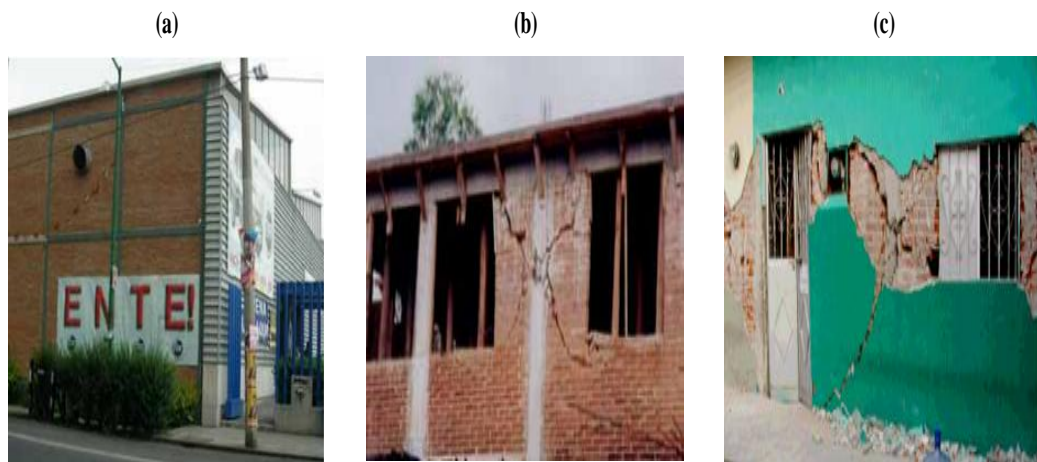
Confined masonry construction in Mexico (a) an engineered structure in the industrial zone (b) minor damage of confined masonry (c) major damage of confined masonry due to inadequate confining elements and their arrangement [40].
